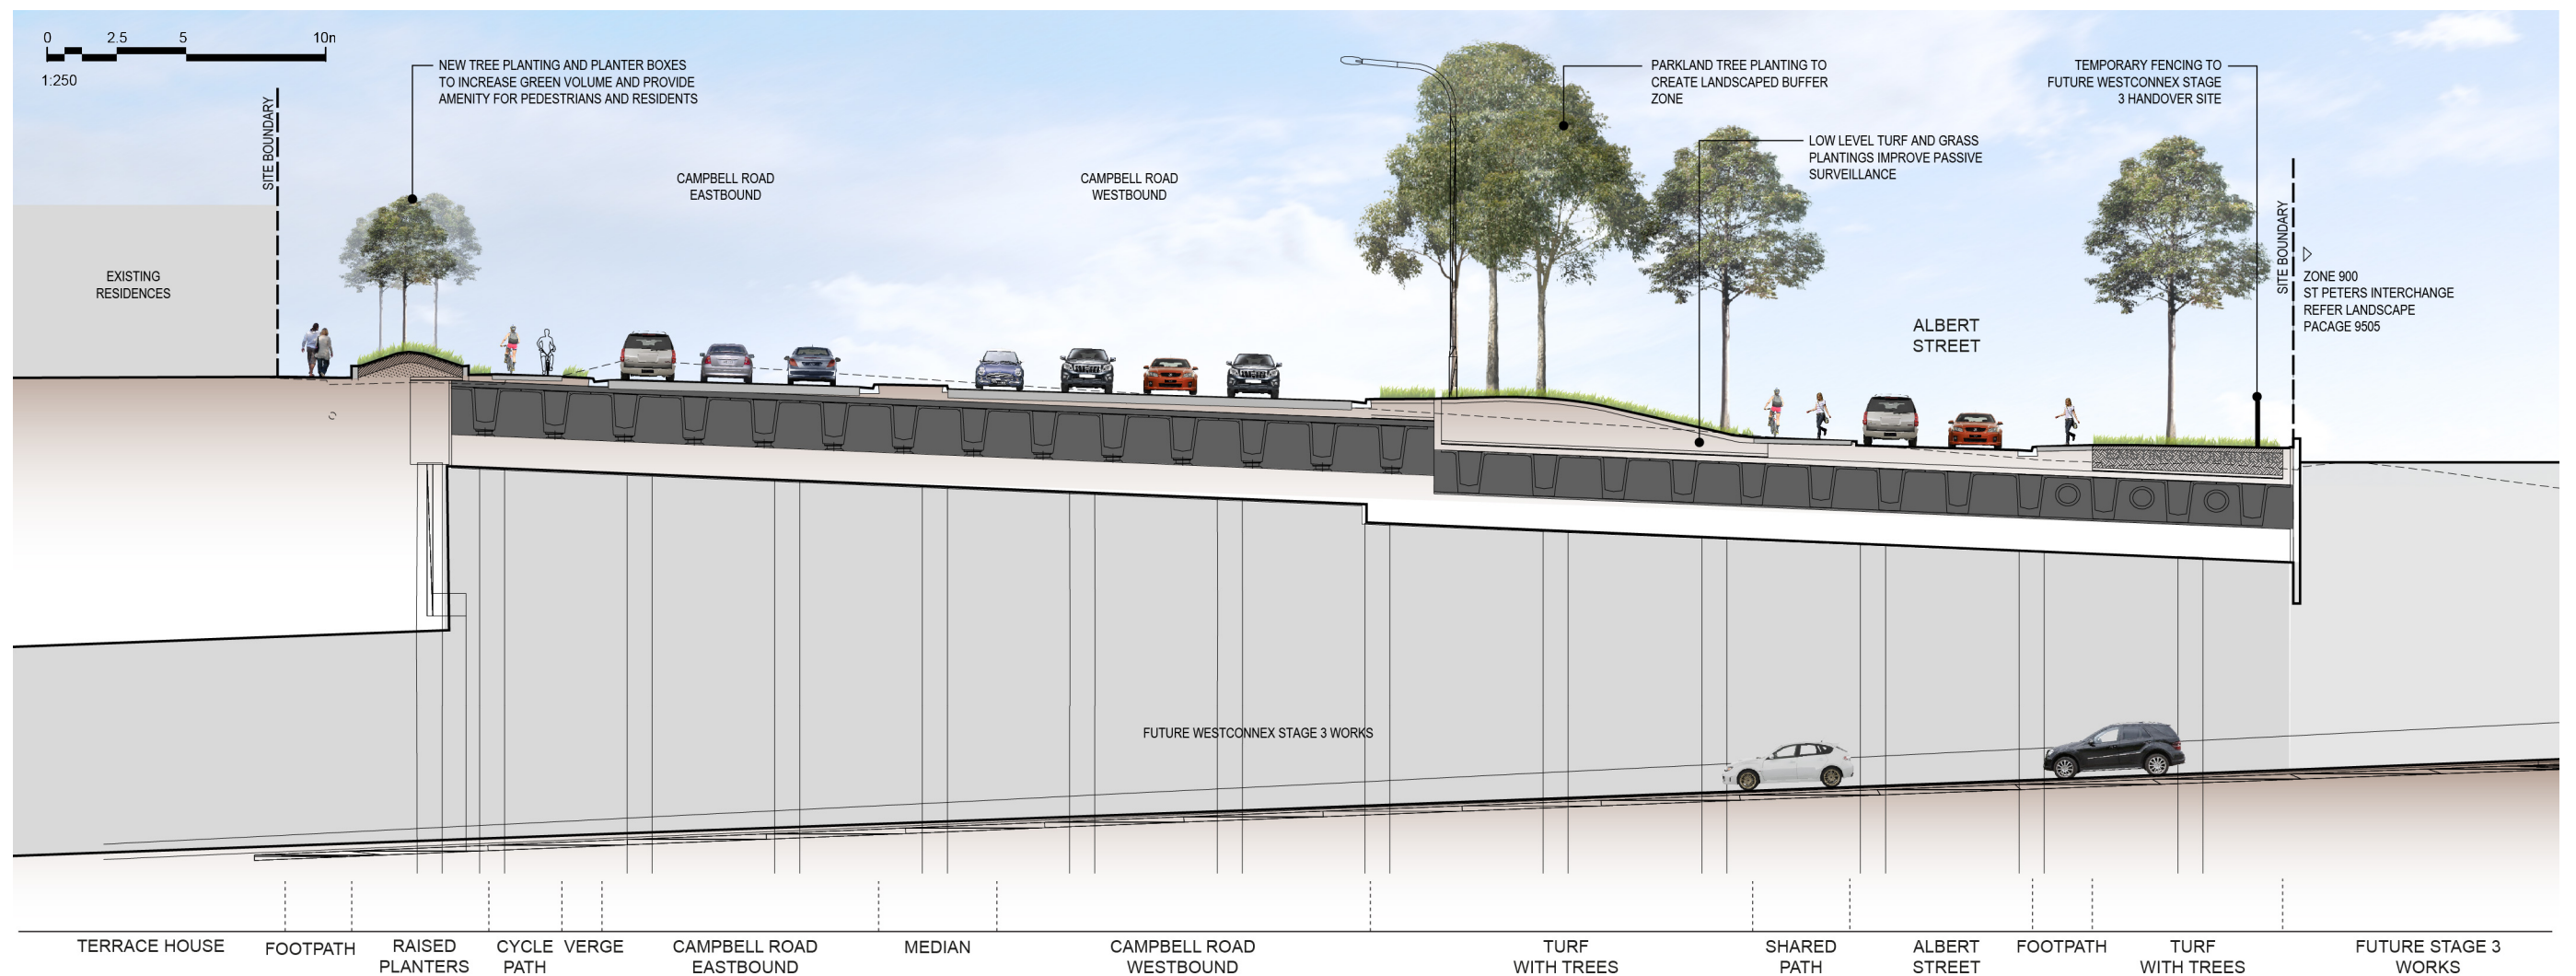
Typical Cross Section - Campbell Street and M4/M5 link tunnel - 1:250
